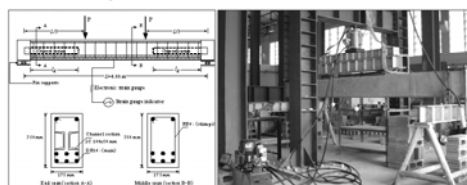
Details and Four-point loading test set-up for the precast reinforced concrete beams.
